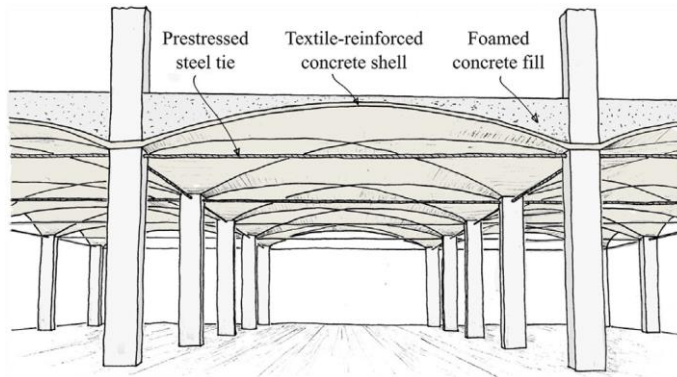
Thin Shell Floor System Concept Sketch [13]
